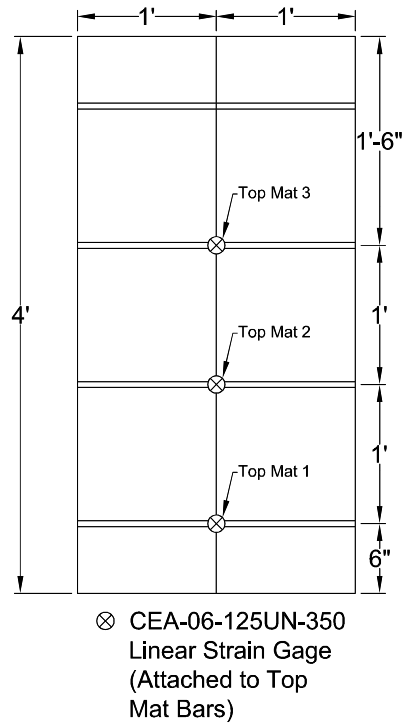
Plan View of Strain Gages 22.5 in. Above Bottom of Precast (All Specimens)
